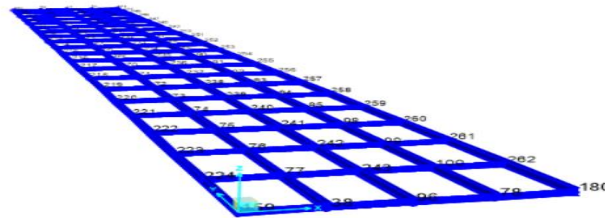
3D view of Longitudinal & Cross Girder Deck.
